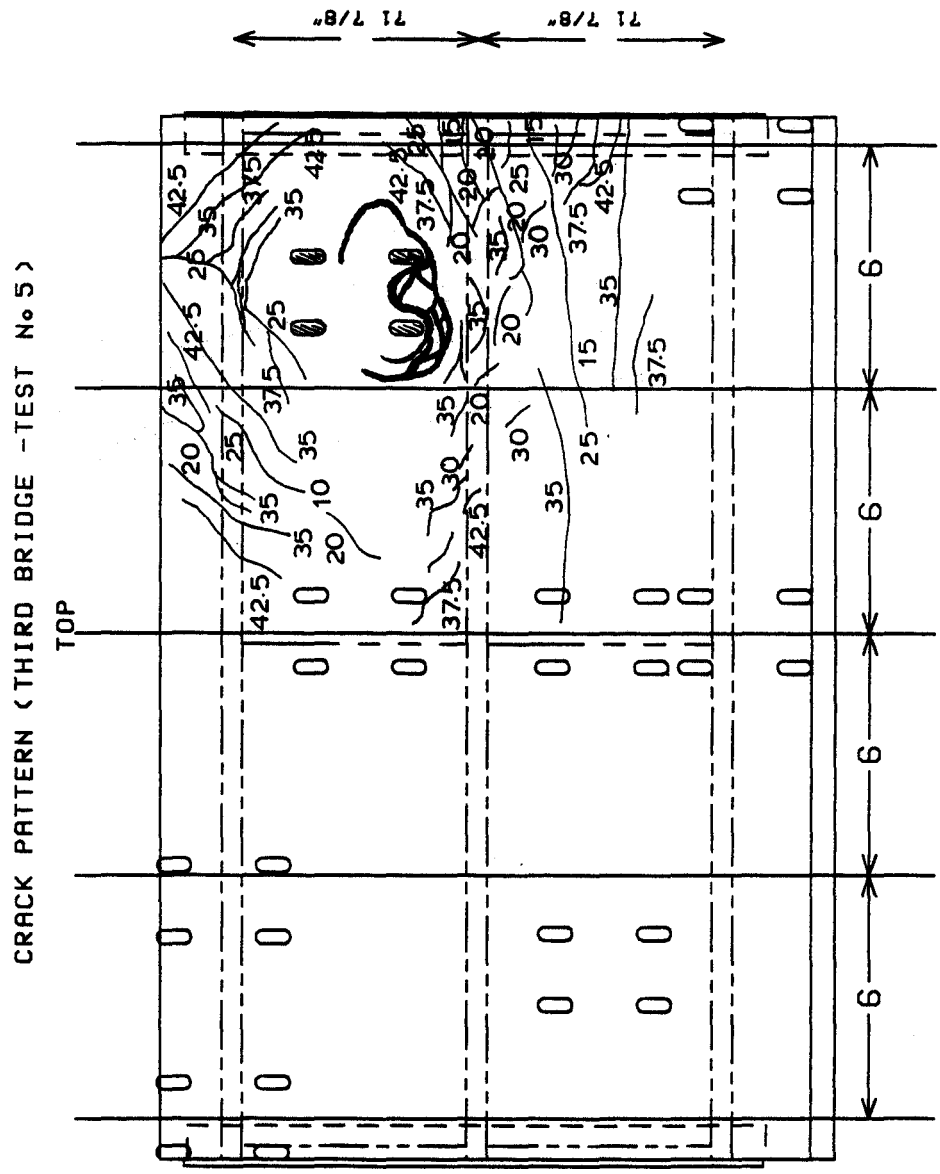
Top Cracking Pattern (Third Bridge - Test No. 5)
